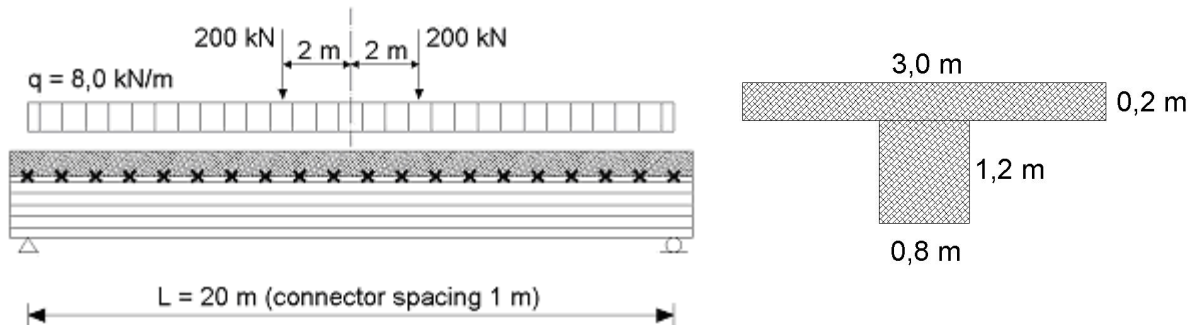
Elevation, cross-section and loading of the wood-concrete composite girder studied.
